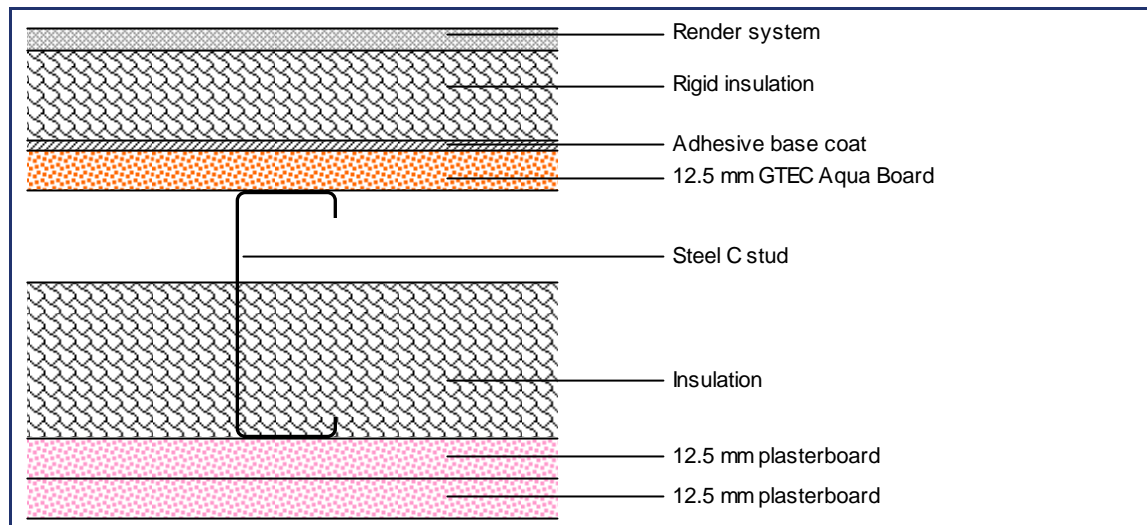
Aqua Board used as external sheathing board with EIFS
